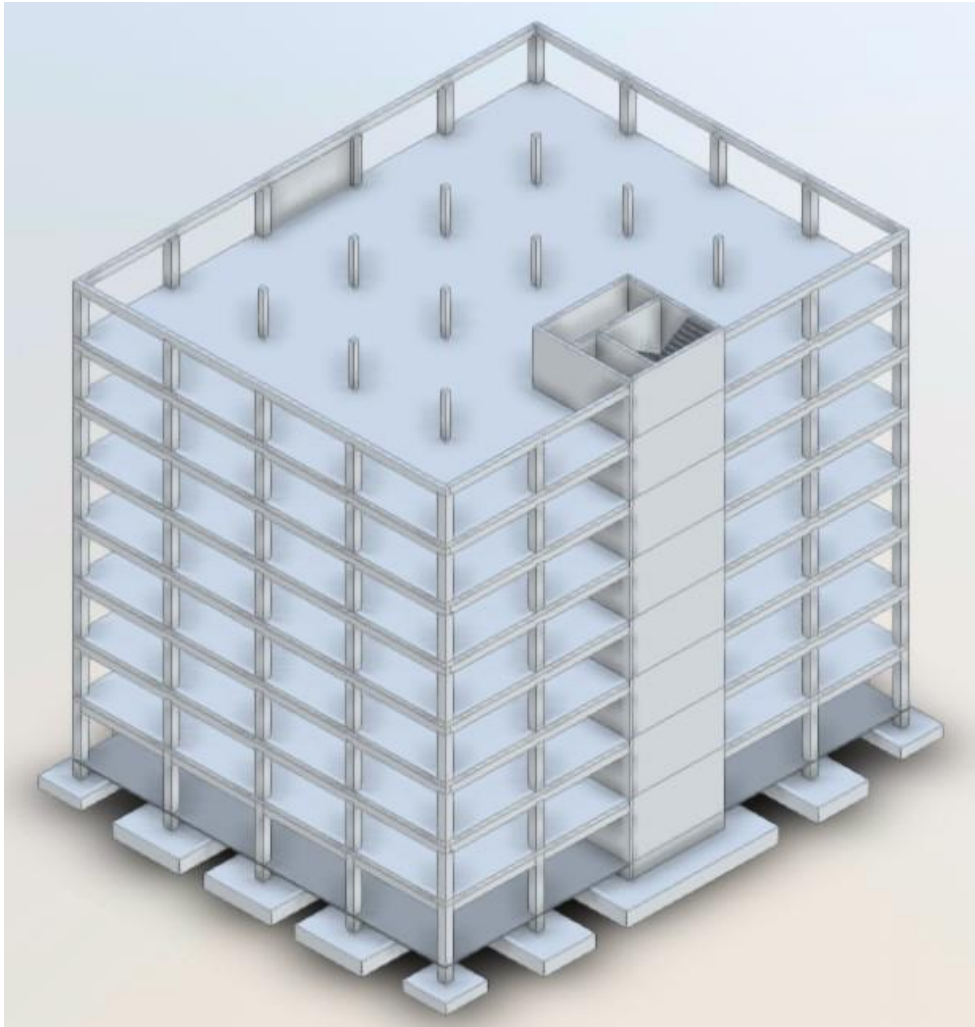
Revit model of the proposed RC building (Van Der Westhuizen, 2020)
